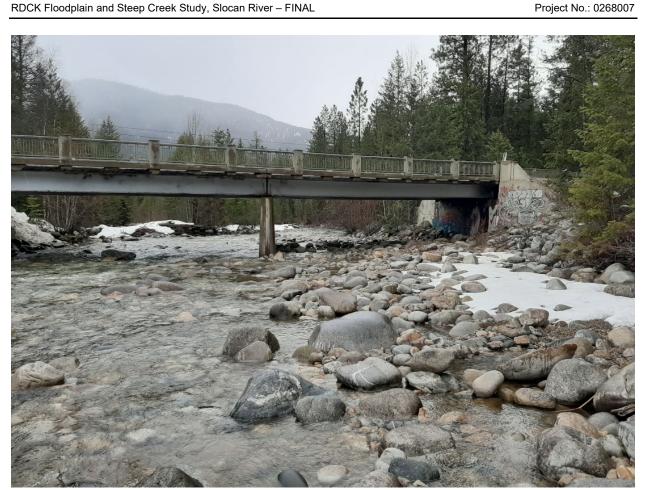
Highway 6 bridge over Lemon Creek standing in the channel looking upstream. Photo: Brian Cutts March 29, 2020.
